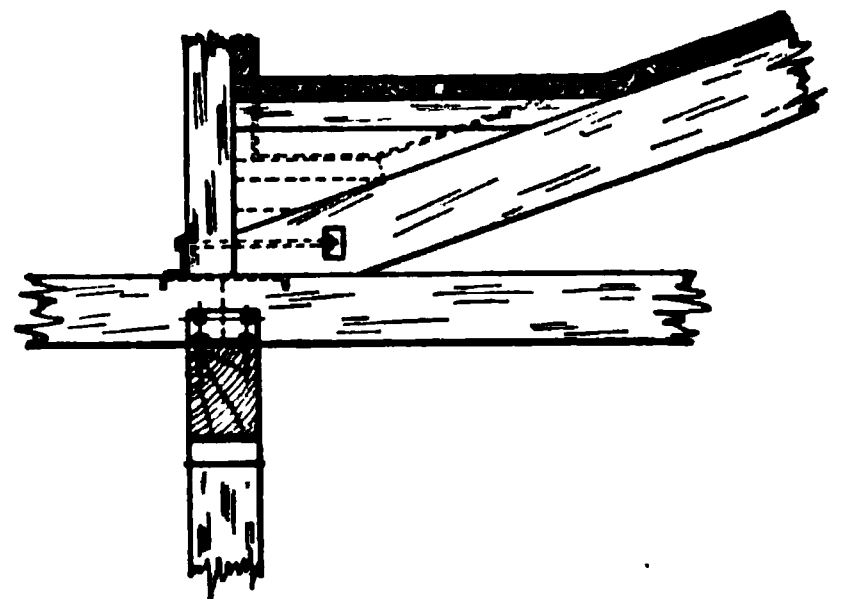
Detail of saw-tooth frame—vertical face with timber ties.
